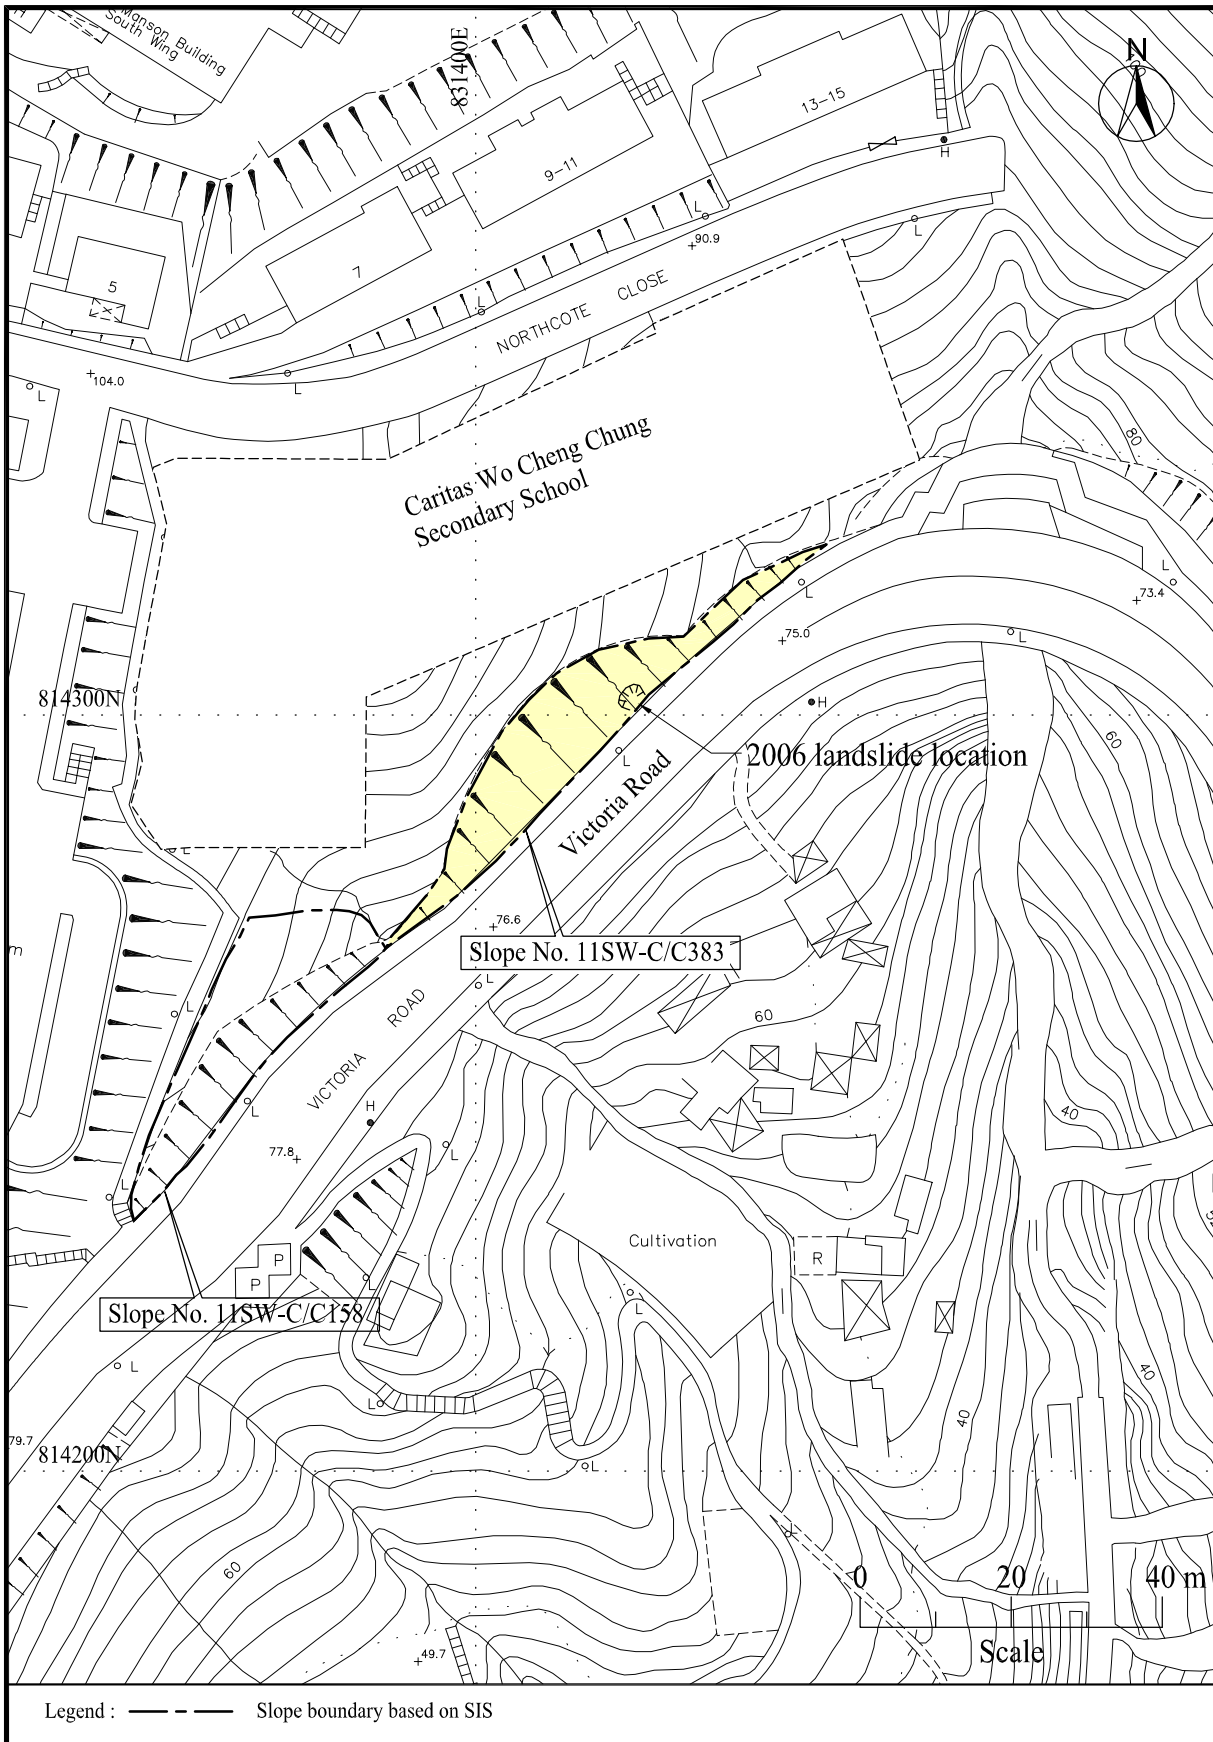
Site Location Plan (Slope No. 11SW-C/C383)
